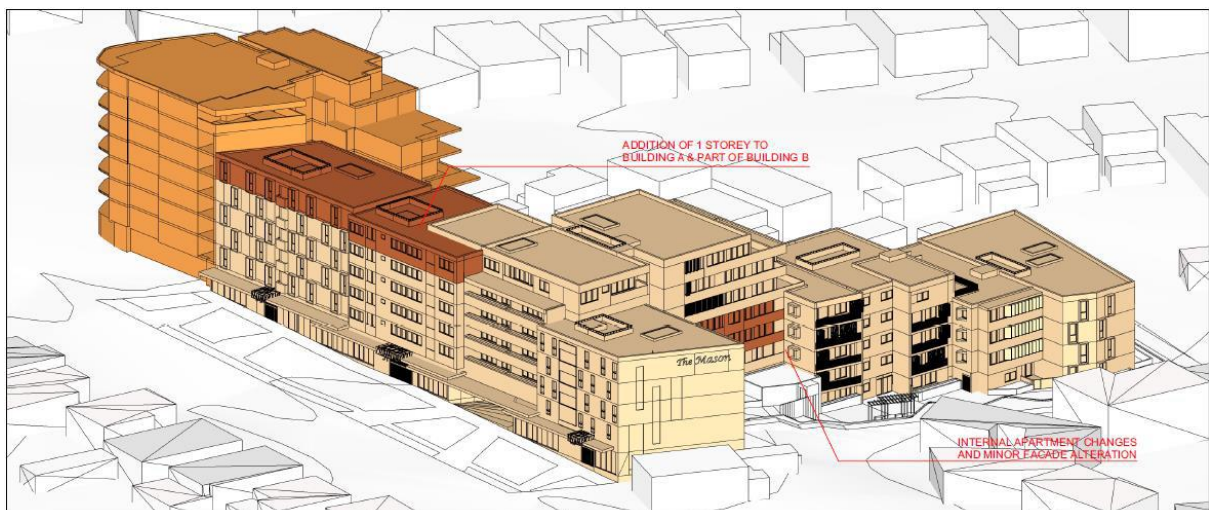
Location of the proposed alterations and additions to the approved building highlighted in dark brown. The approved adjoining development at 37-39 Punchbowl Road and 90 Water Street is highlighted in orange.
